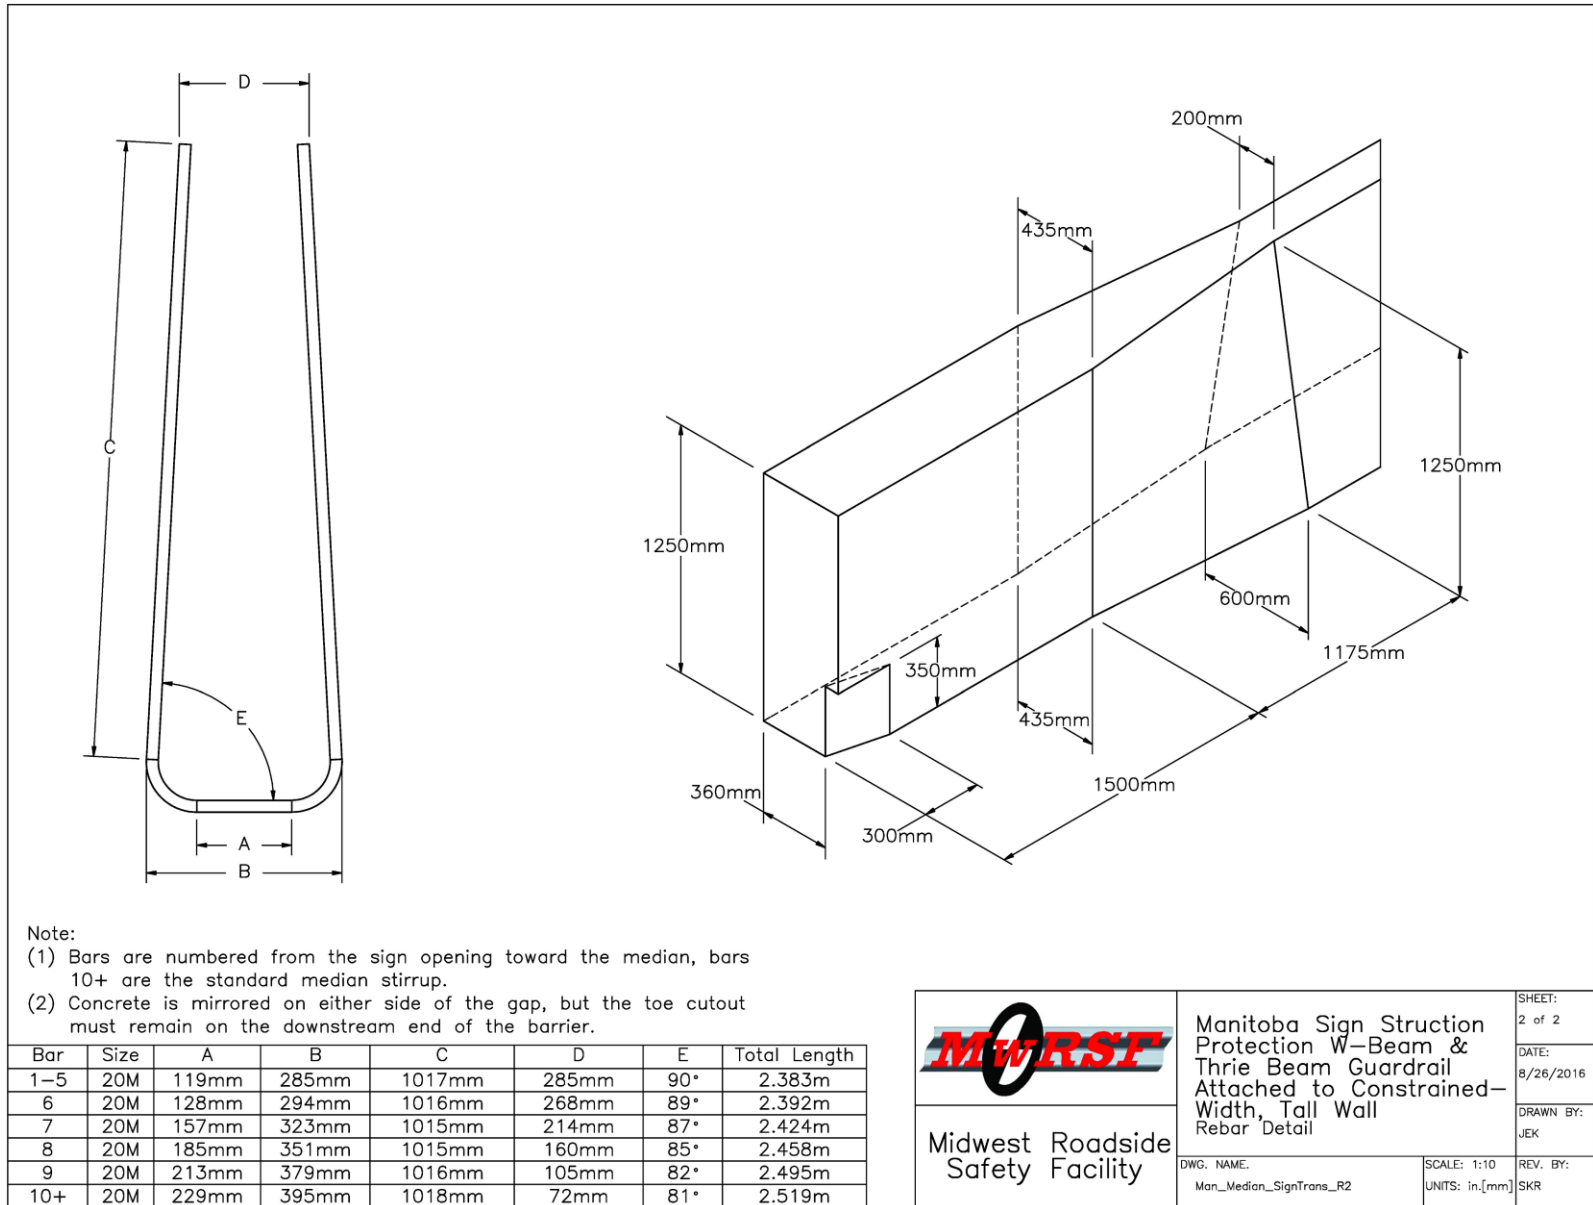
Treatment Details for TL-5 Barrier Gaps Spanning Large Sign Supports
